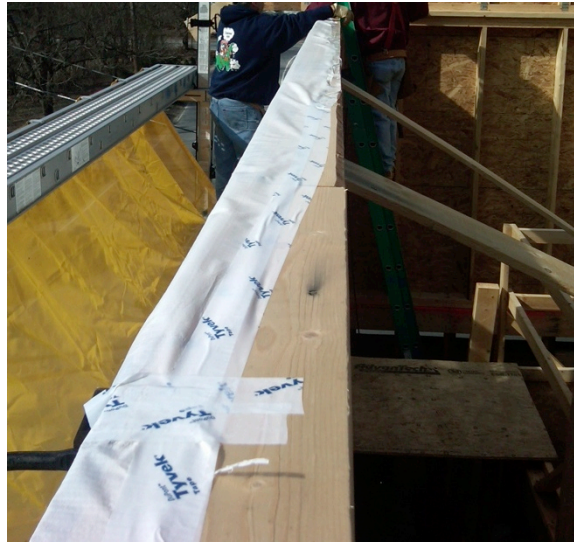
House wrap airflow control transition at top of wall at Test Home 5
